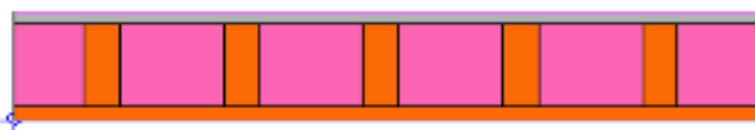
Simulated Stud Distance in Plan View of Wall Section Accounting for Framing Factor (Source: Straube & Smegal, 2009)
